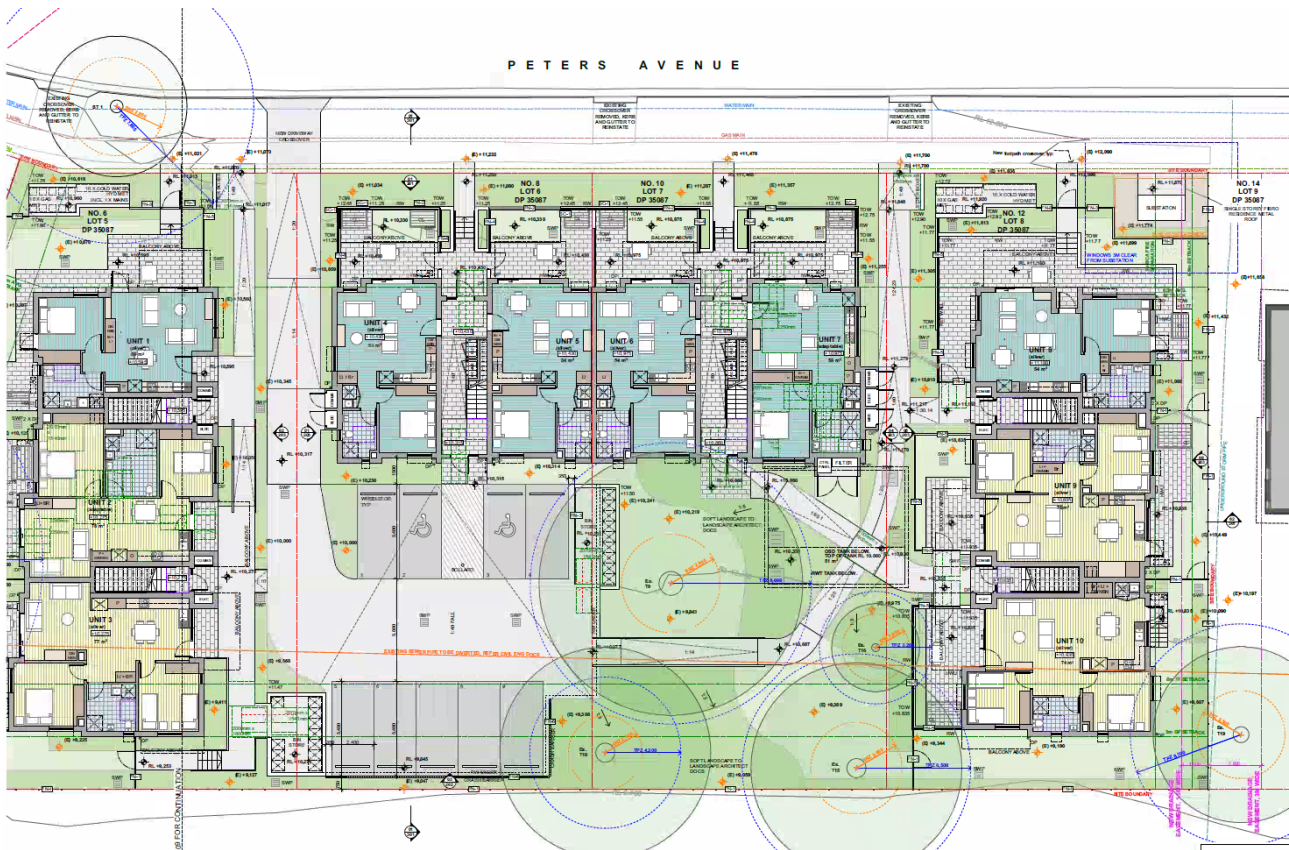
Extract from Architectural Plans – Ground Floor Plan (south) (Source: Architectural Plans, Sam Crawford Architects)
